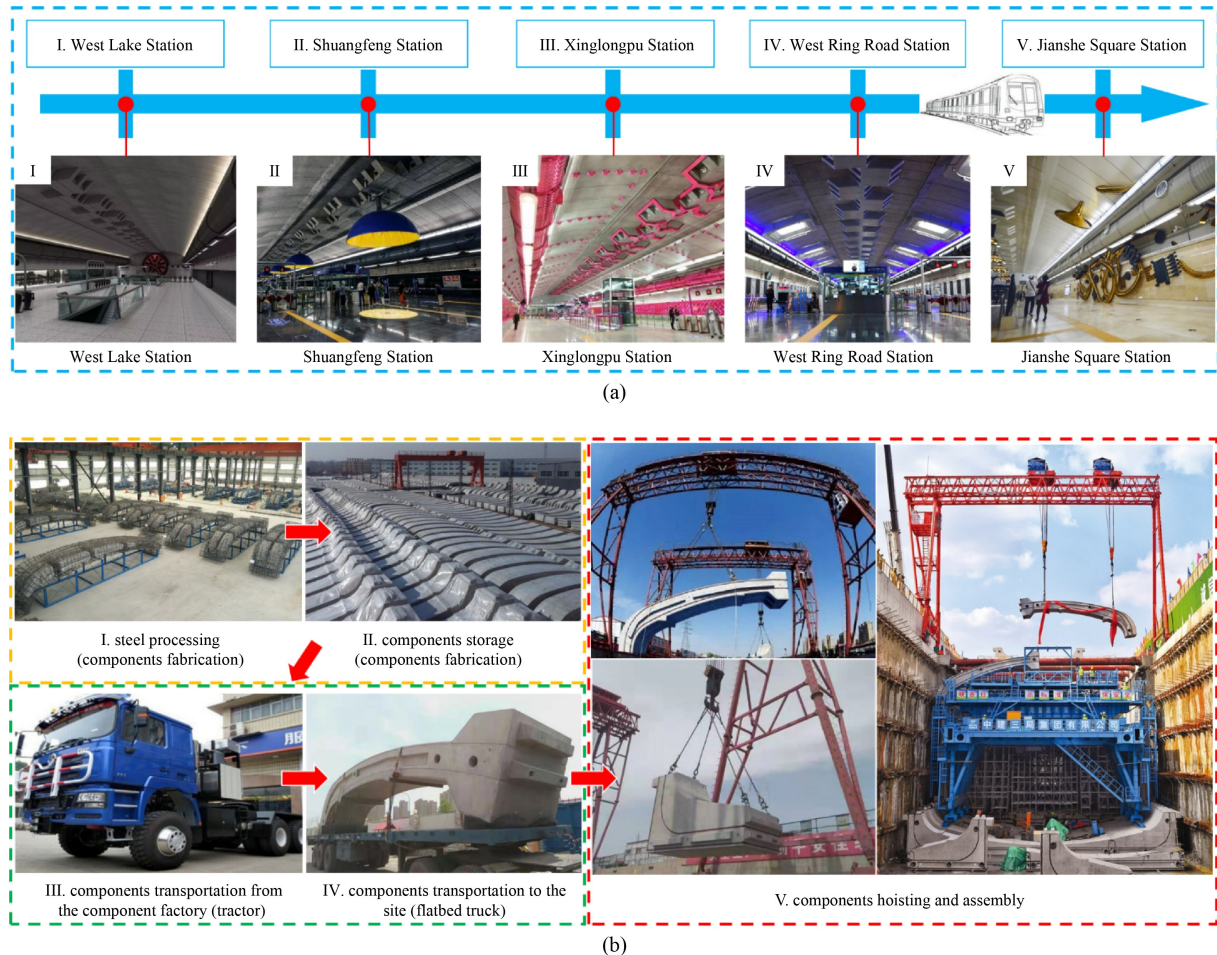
Prefabricated subway stations in Changchun, China: (a) five prefabricated subway stations of Changchun Rail Transit Line 2; (b) construction process of the PSSS.
